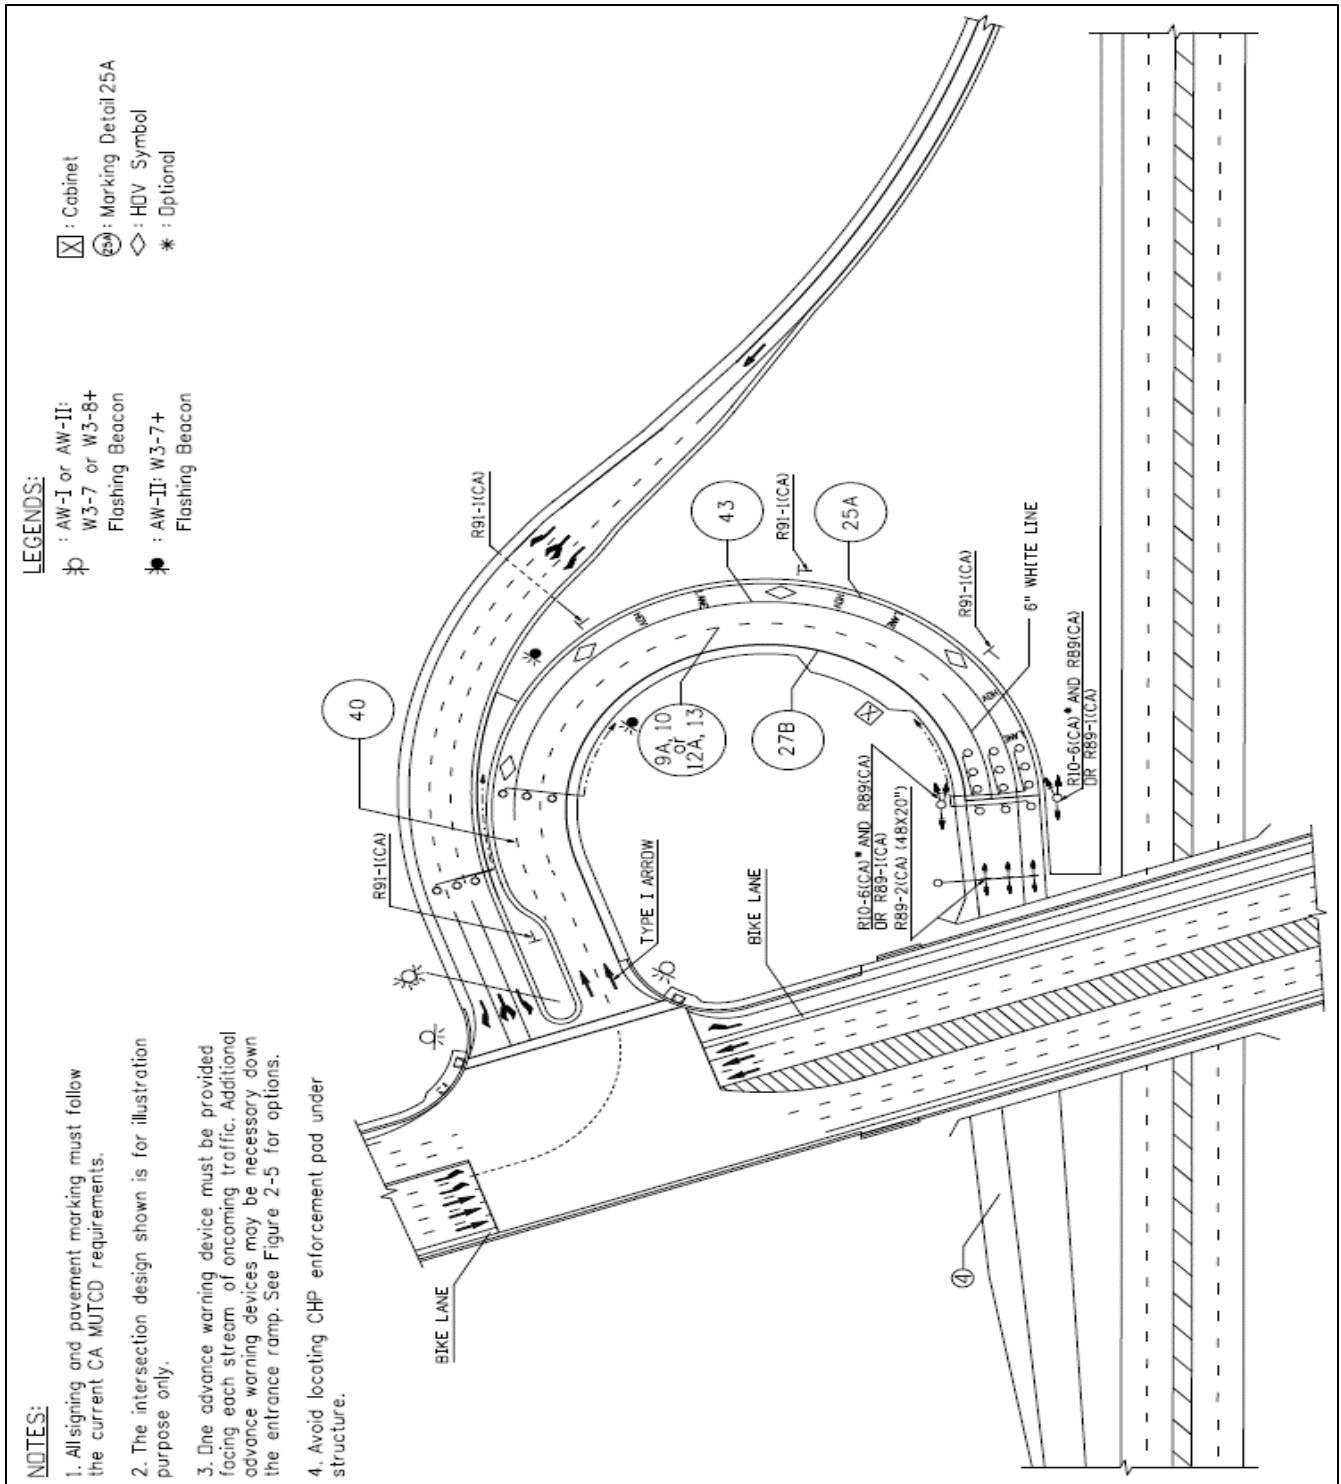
Typical Signing and Pavement Marking (3-Lane Loop Entrance Ramp, 2 GP Lanes + 1 HOV Preferential Lane)
